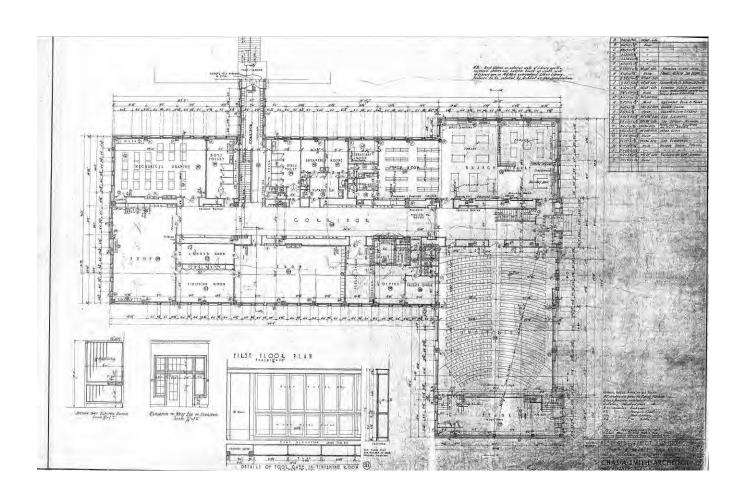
West Side Jr. High School 1925: First floor plan Charles A. Smith, architect
